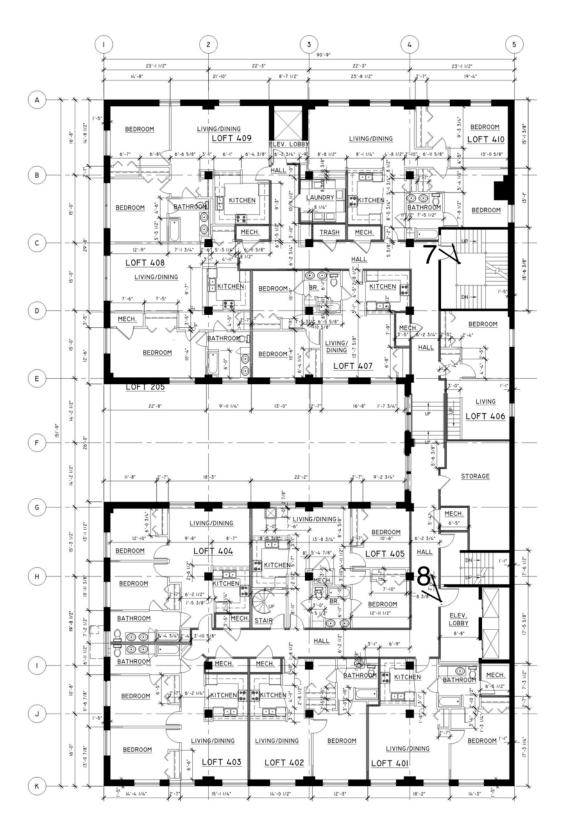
Fourth floor existing plan. Source: Design Build By Architects (2017).
